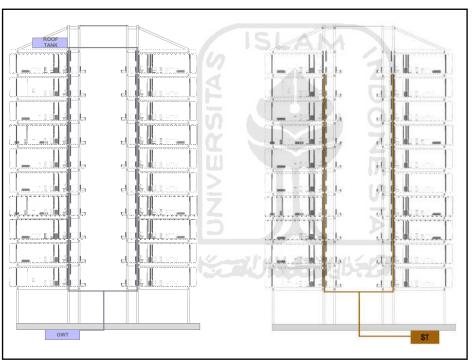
Apartment clean and waste water system Source: Author (2021)
